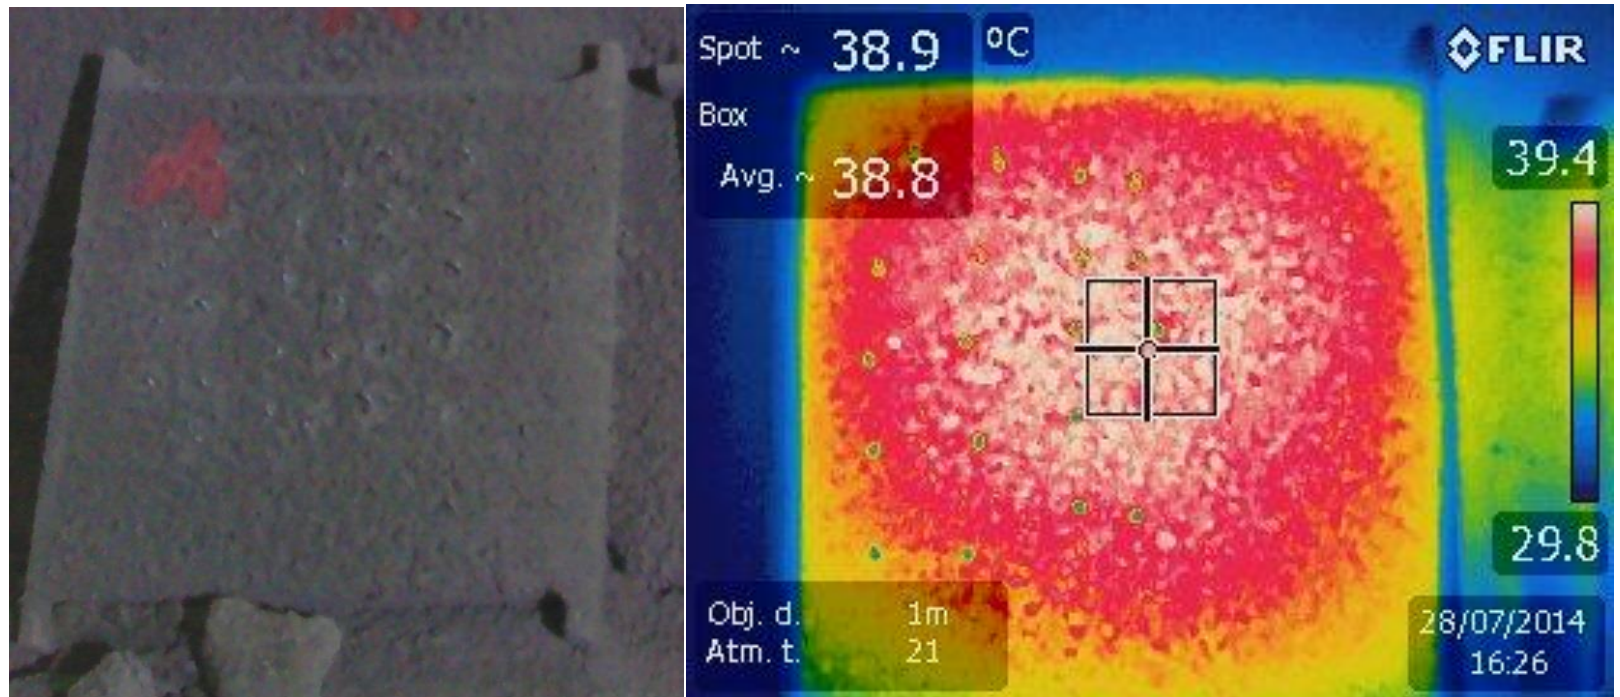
Whitechapel station sprayed concrete panel testing and thermal monitoring
